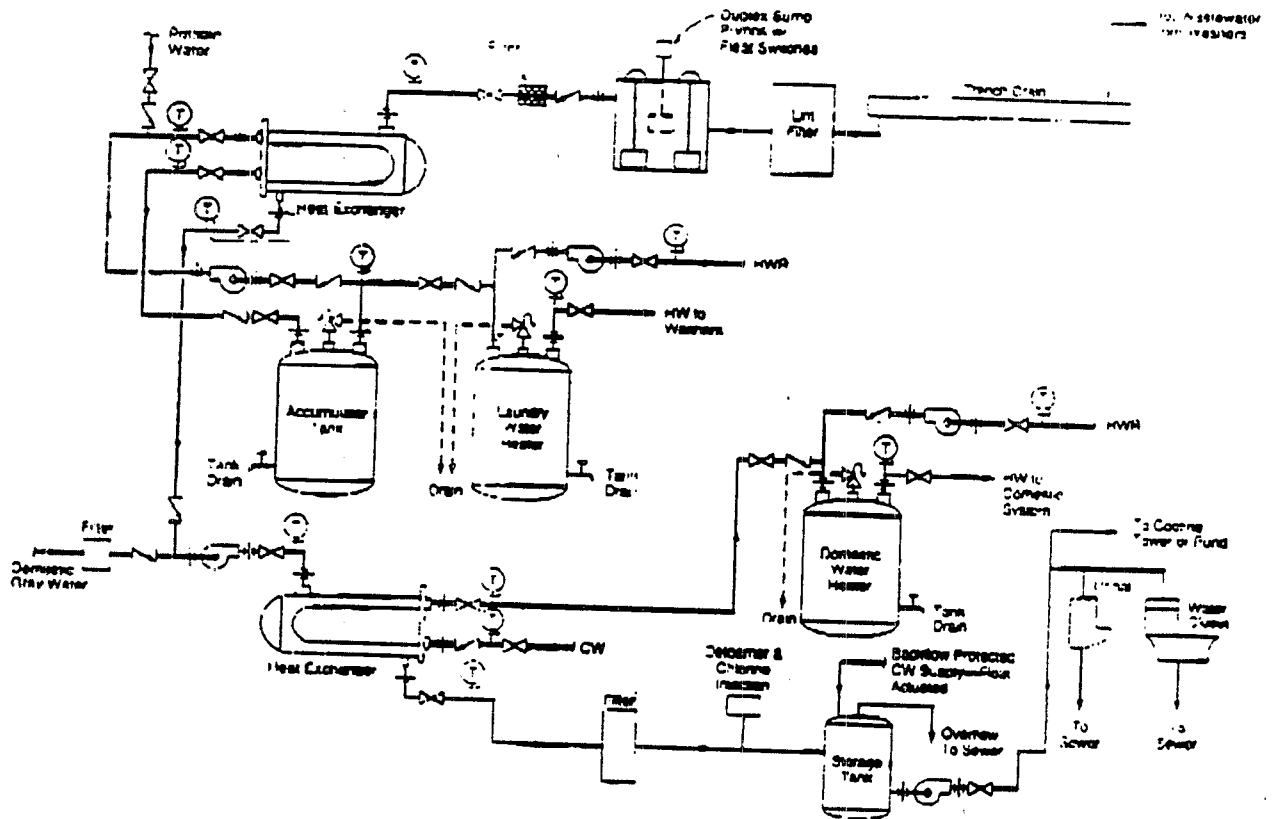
Waste Heat Recovery System for Commercial Laundry Facility
